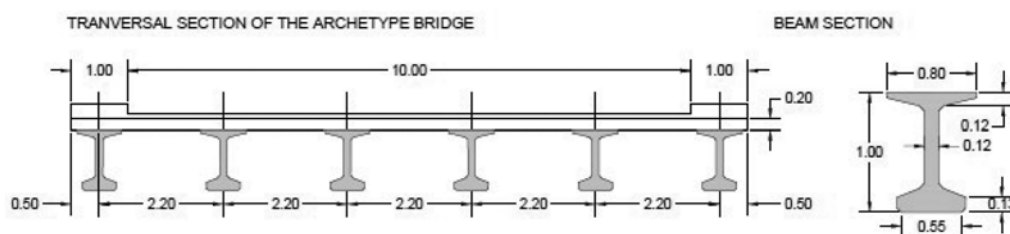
Bridge deck cross-section and concrete girder cross-section general data.
